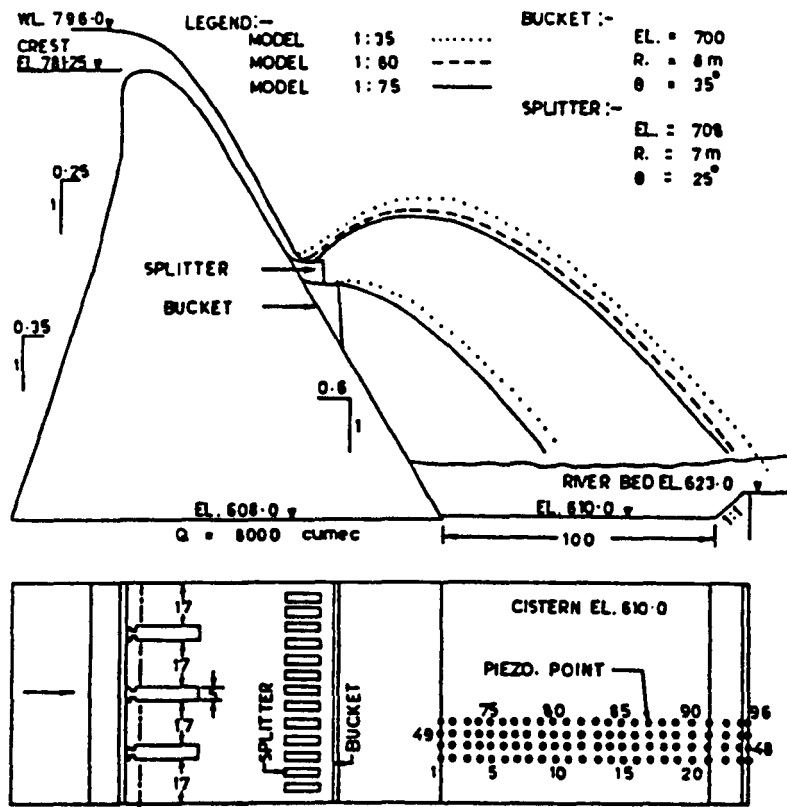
SECTION AND PLAN OF LAKHWAR DAM MODEL.
